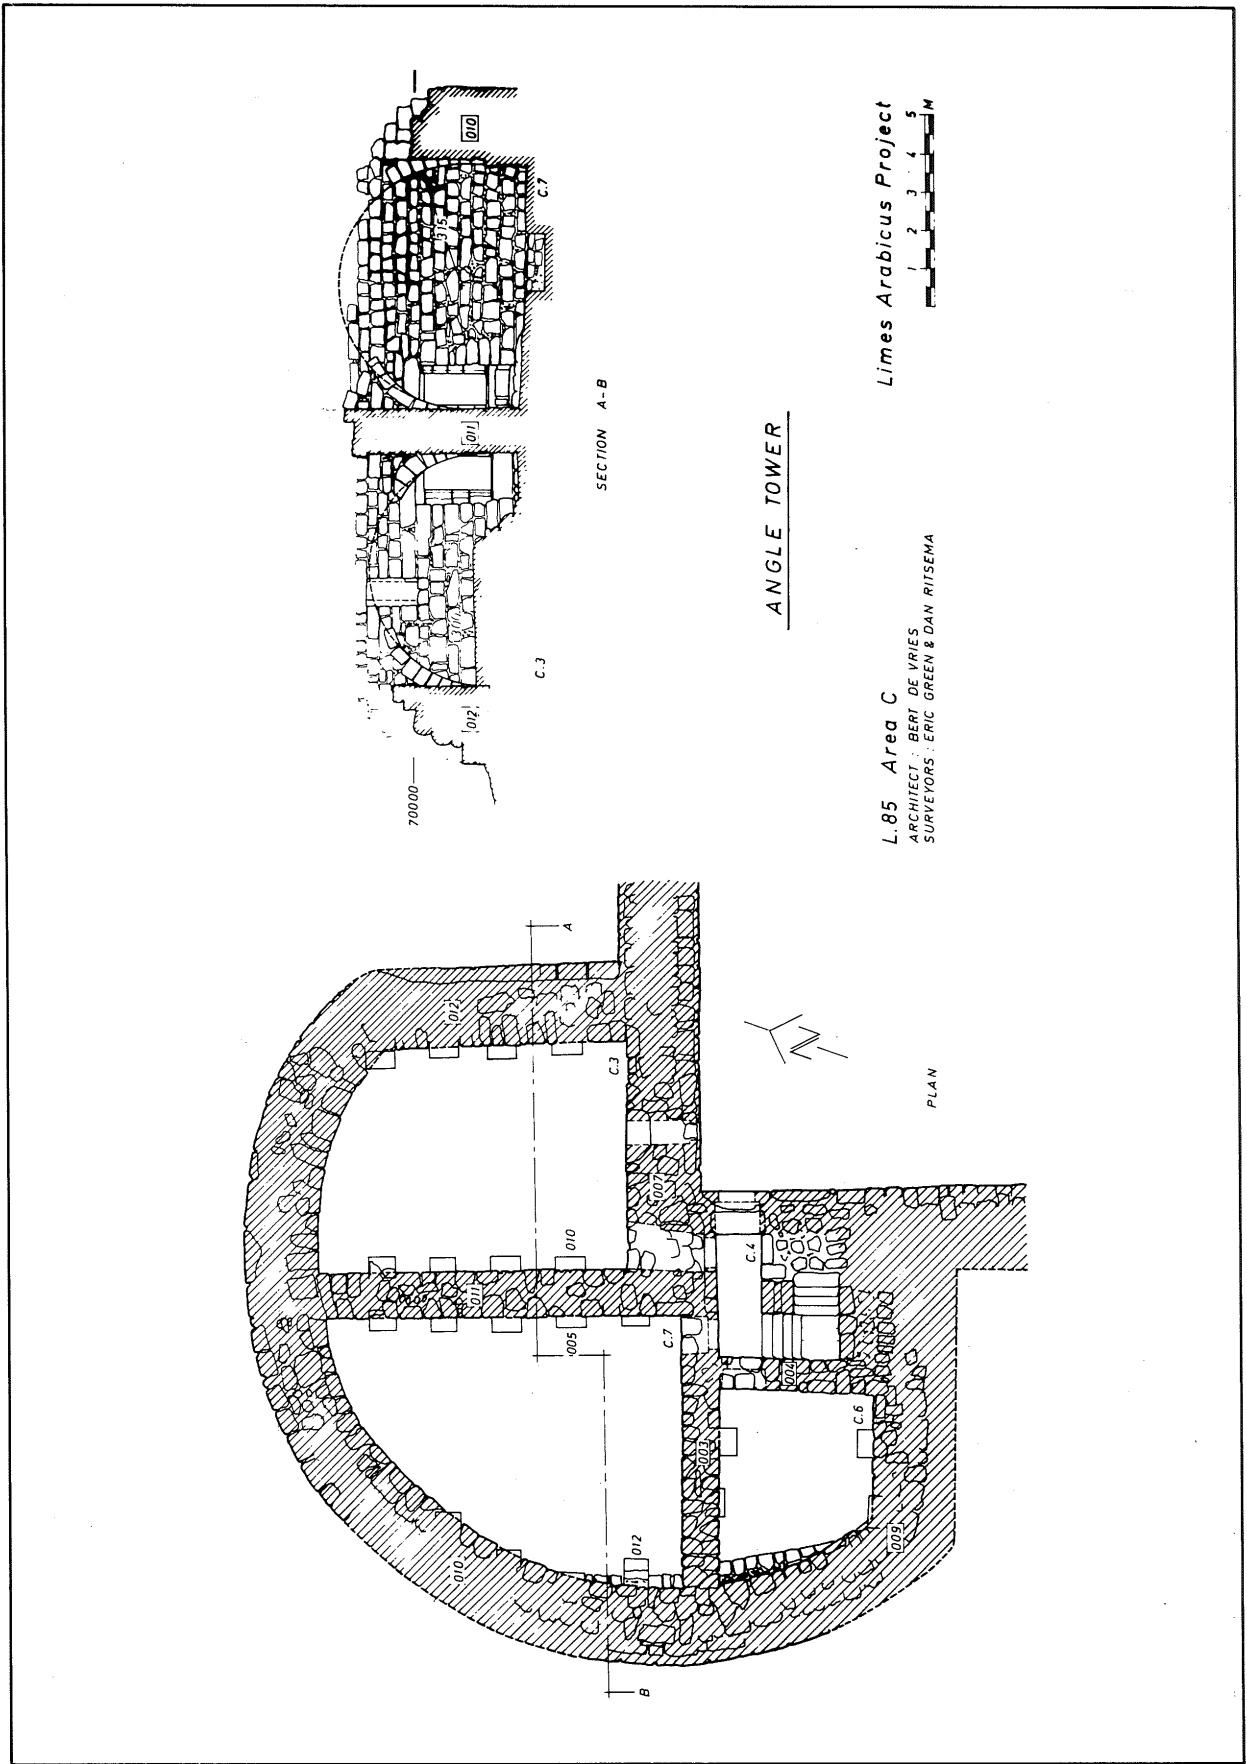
Plan and section of the northwest angle tower of Lejjūn.
